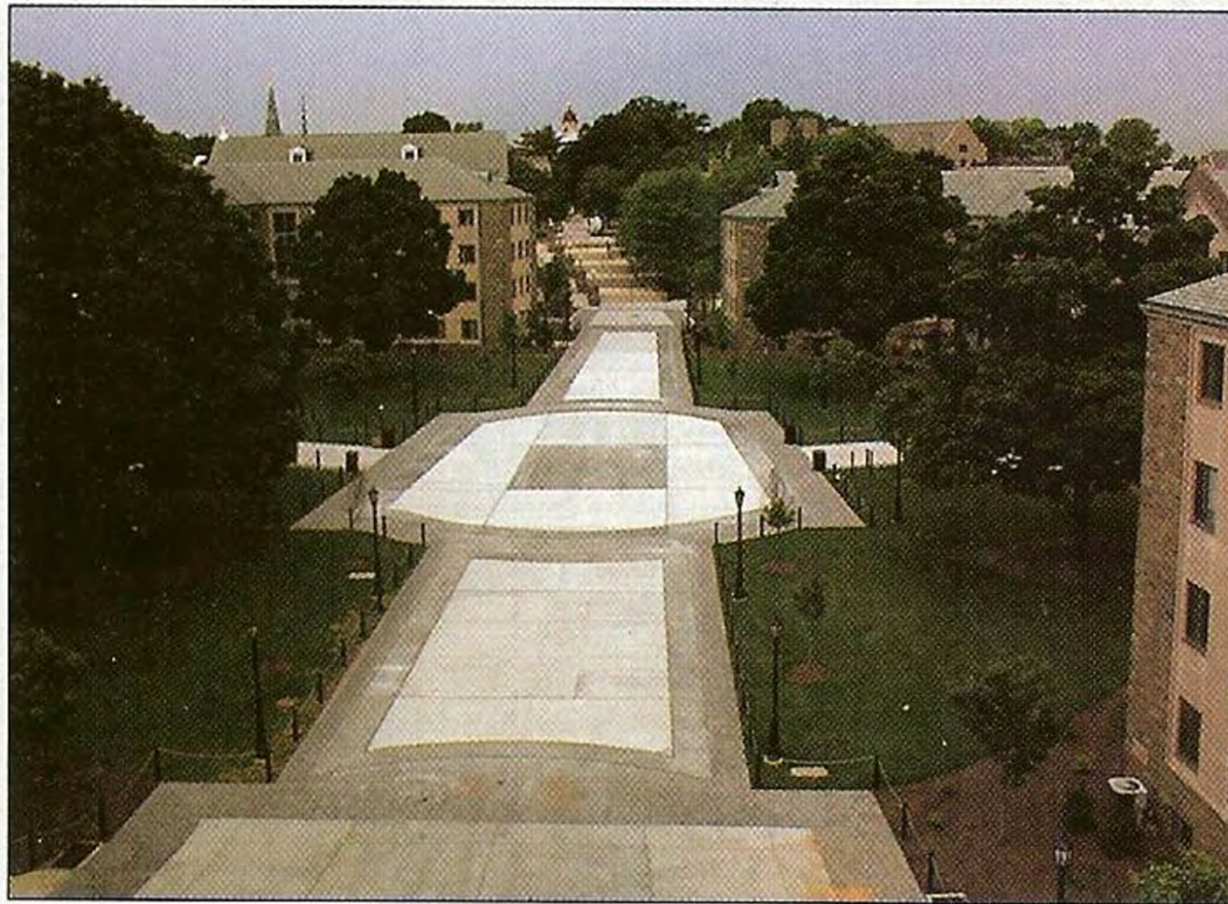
A porous concrete infiltration facility was constructed over one of Villanova University's high-pedestrian-traffic areas.
